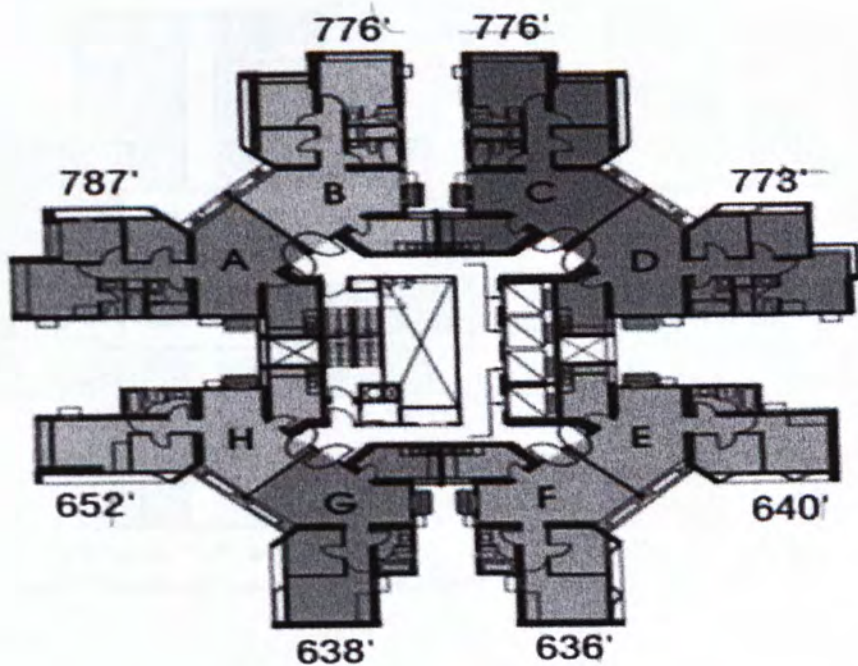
Figure for example 1 (Floor plan of “Diamond-shape” living room)⁴⁰, South Horizons
